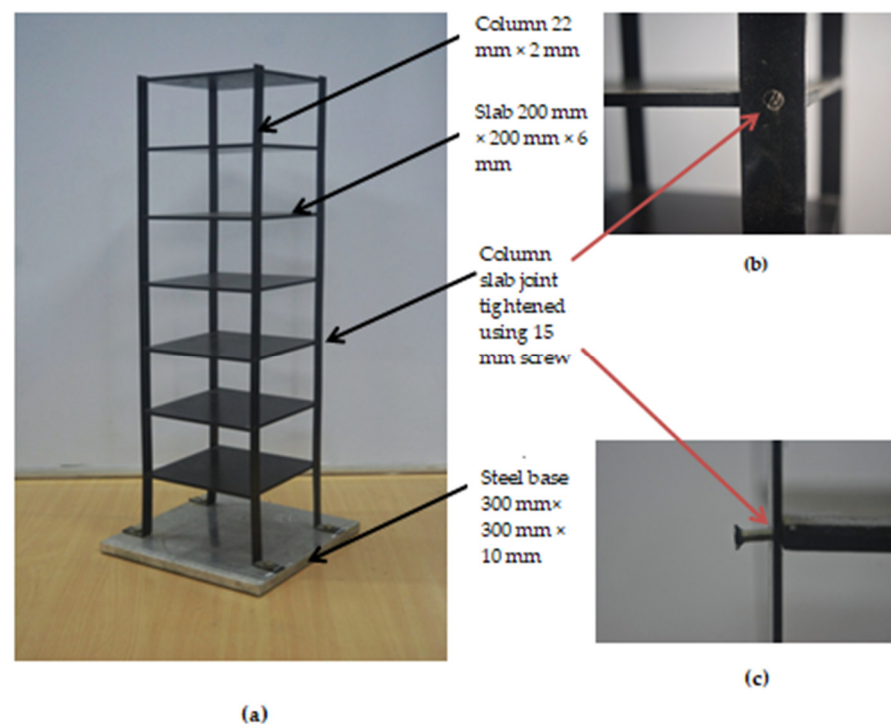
Fabricated scaled superstructure model: (a) overall view, (b,c) joint details.
